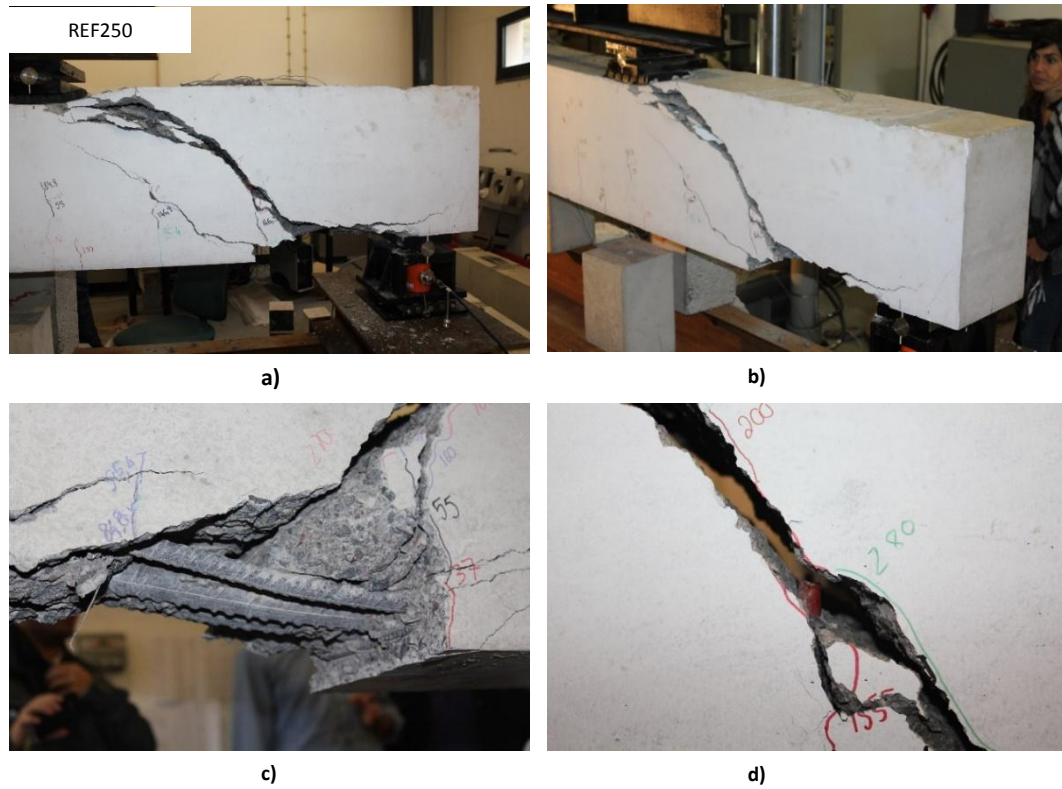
REF250 beam failure: a) front view of the support; b) overall view of the failure; c) bottom reinforcement; d) broken stirrup
